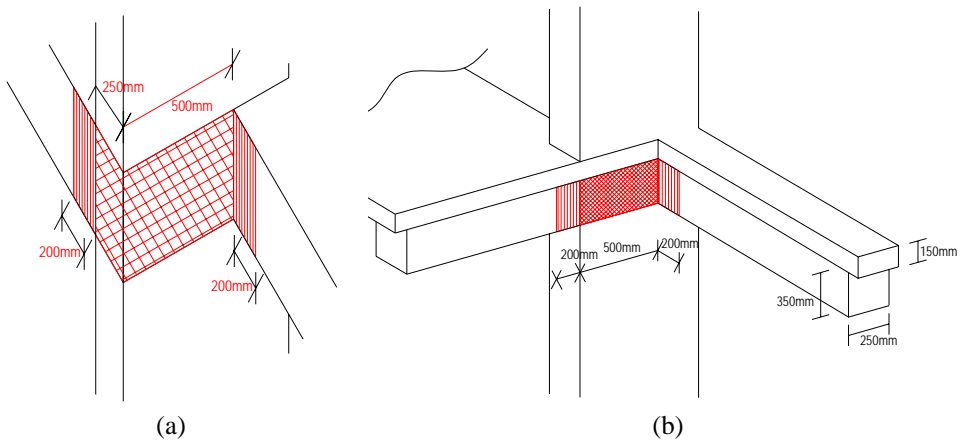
Outer (a) and inner (b) portion of joint of column C6
